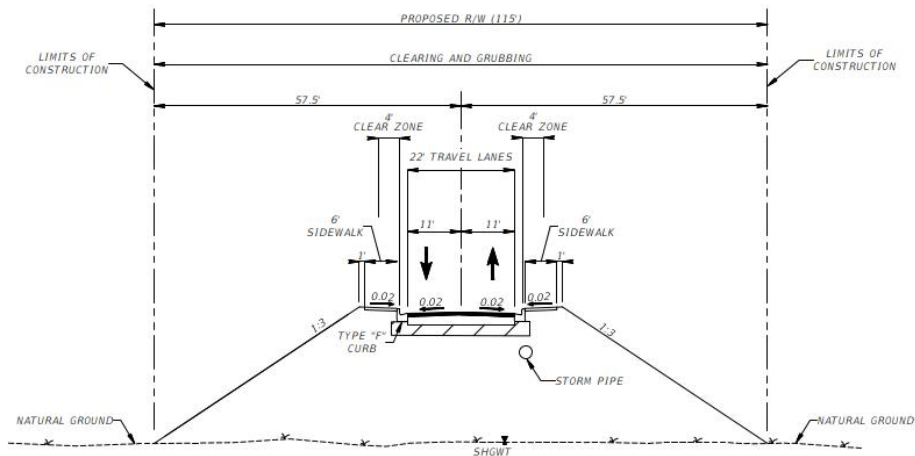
Build Alternative Typical Section, Longpoint Way Extension
